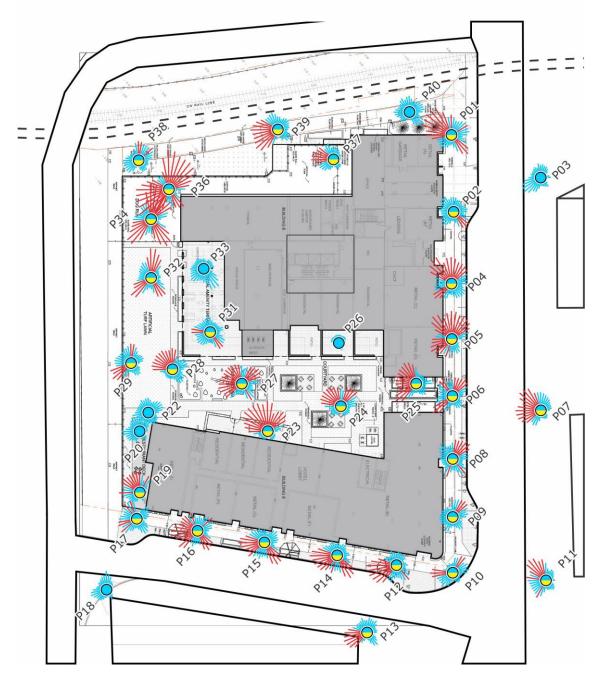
Wind Tunnel Results (Summer) – Parking Level 0 and Level 1 Plan Future Site Conditions (results shown without treatments applied)
